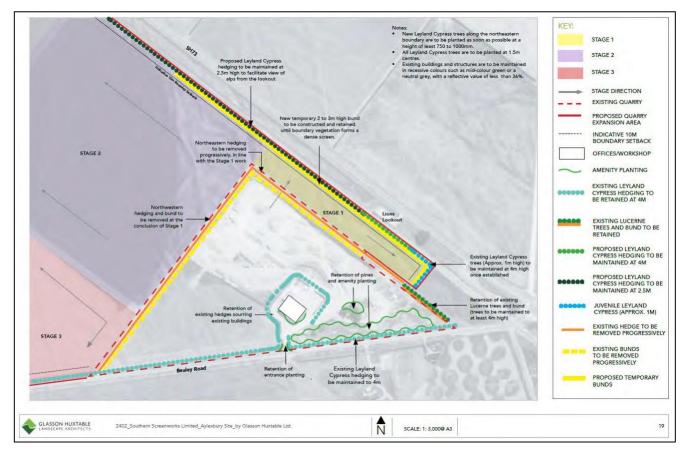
Proposed Landscape Mitigation Plan for Stages 1 and 2 (Source: AEE)
